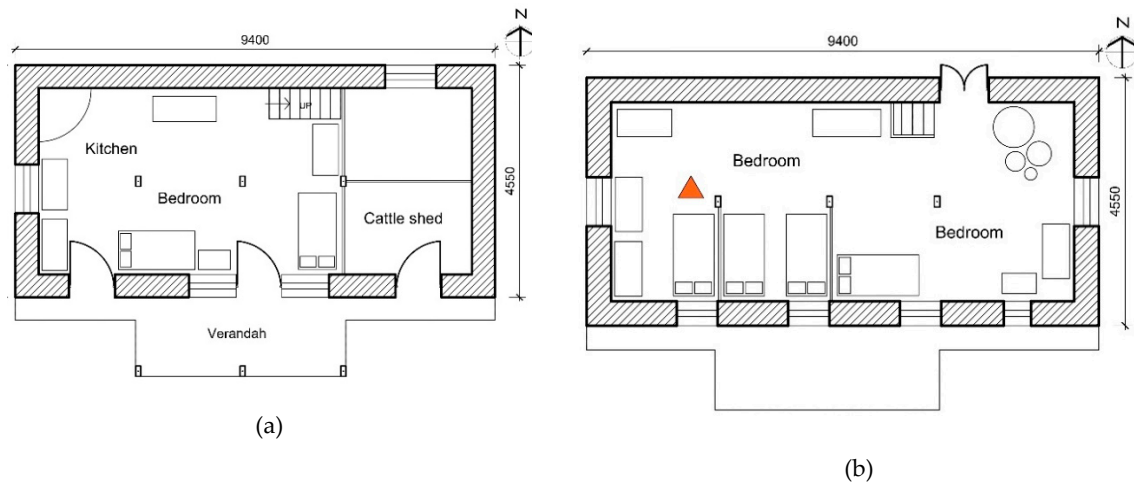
Floor plans of a typical vernacular house: (a) Ground floor plan; (b) First-floor plan.
